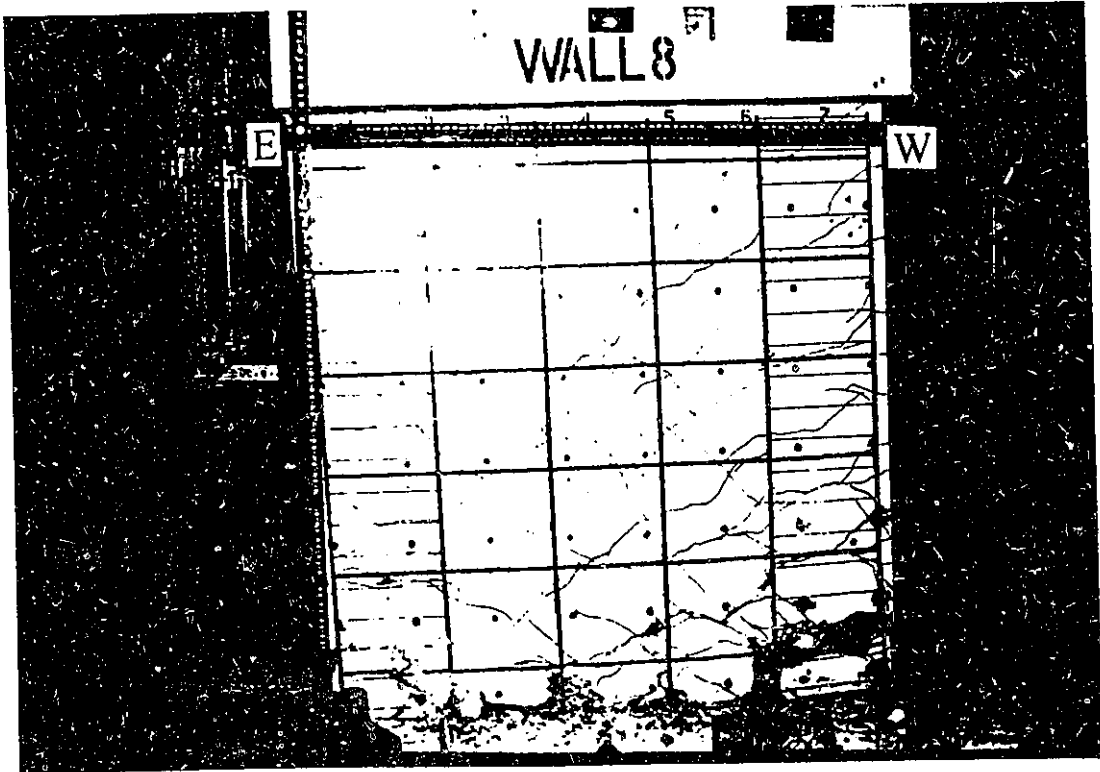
Wall 8 Crack Pattern at the End of Test
